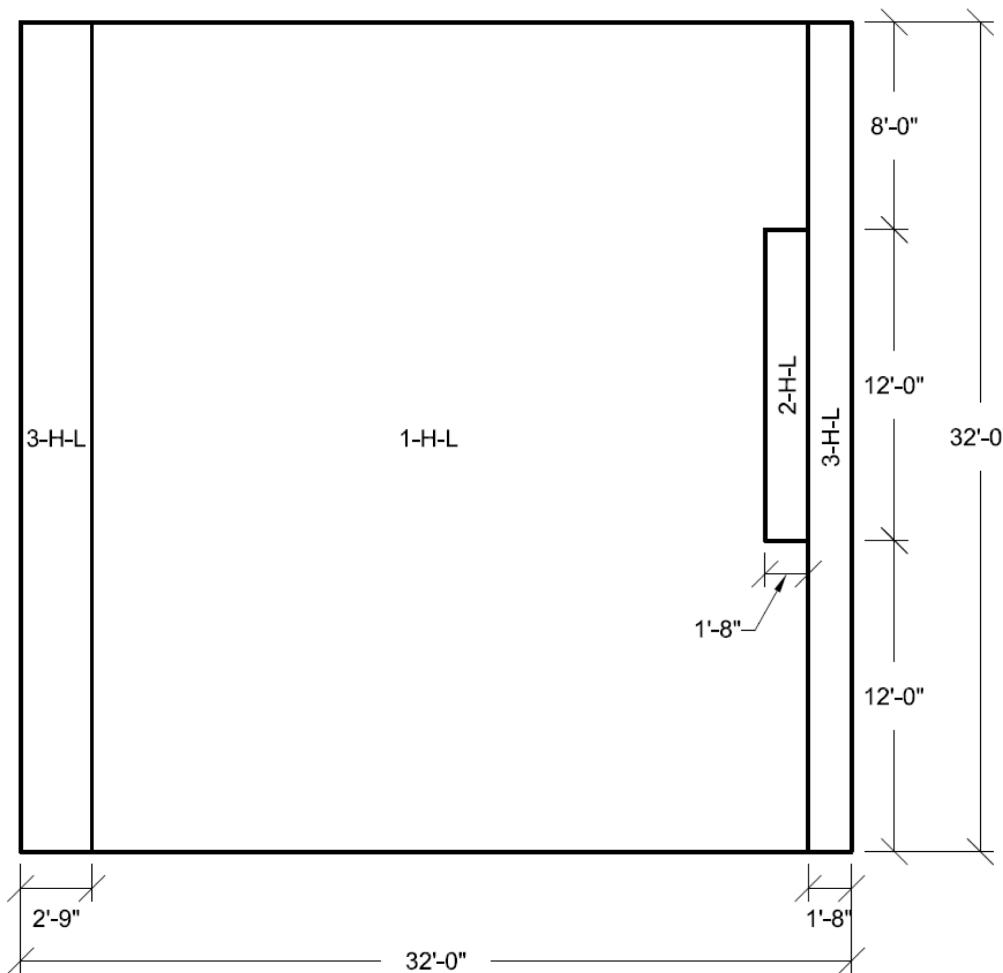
H.6-182 DGFO SV Wall 11 Looking From Outside
